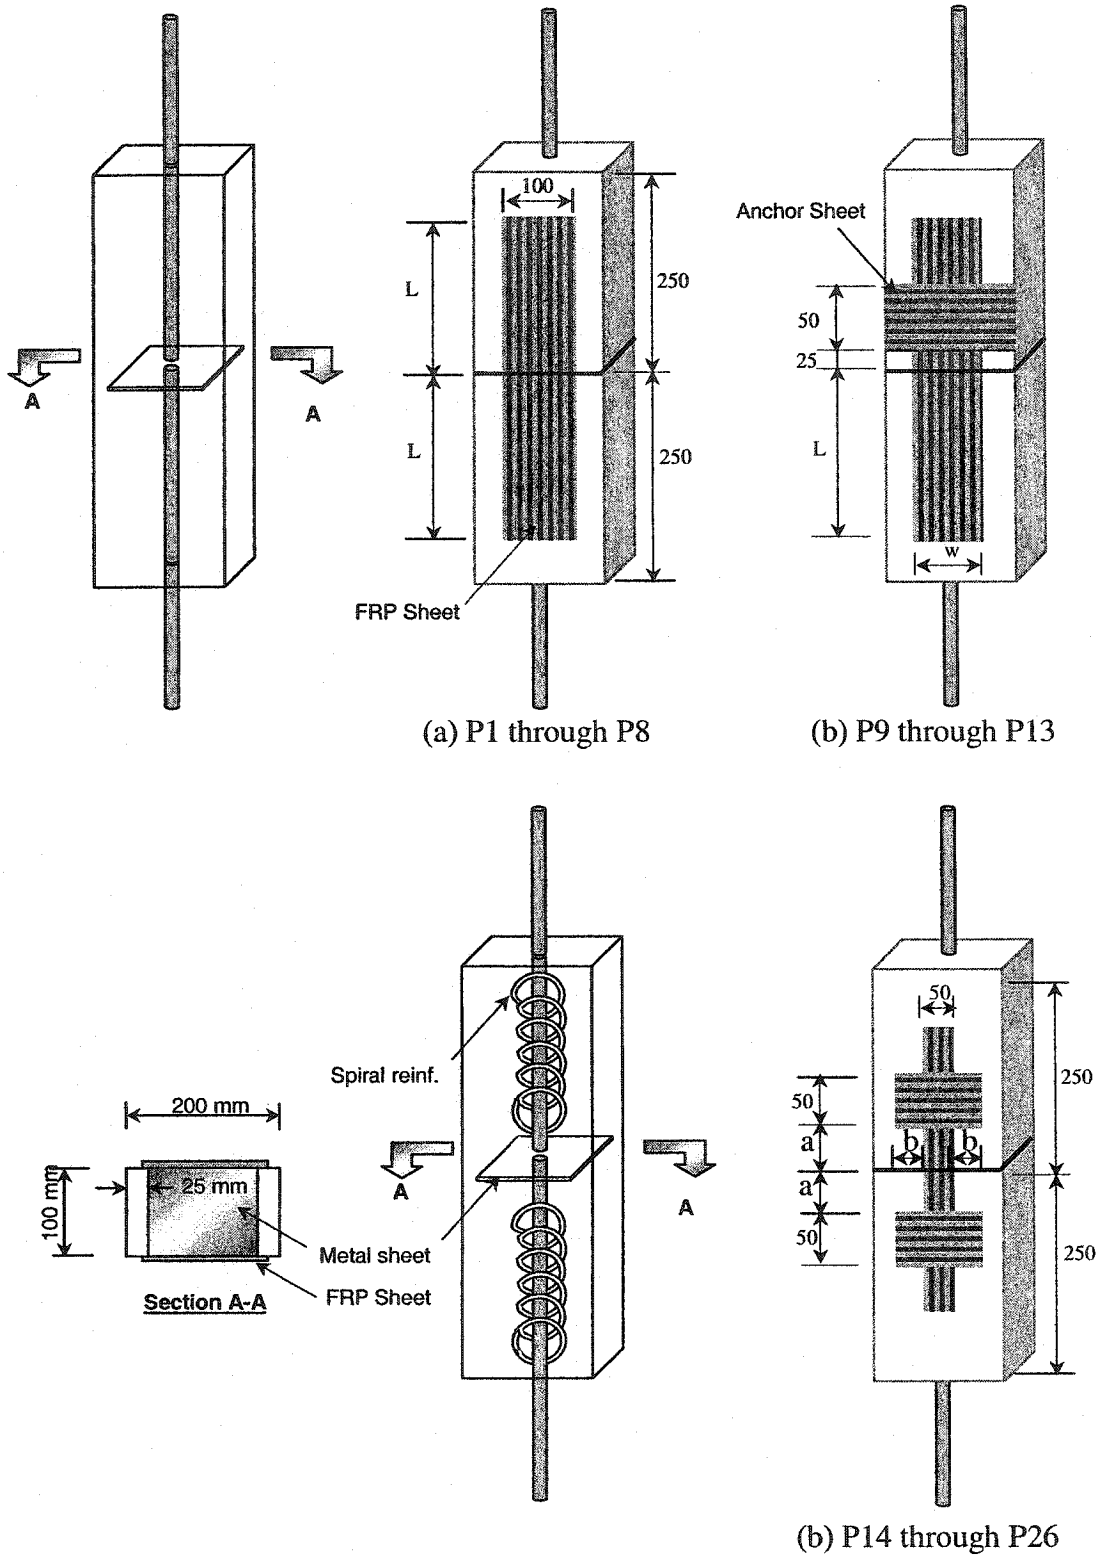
Pull-apart specimen dimensions, details, and sheet and anchor configurations
